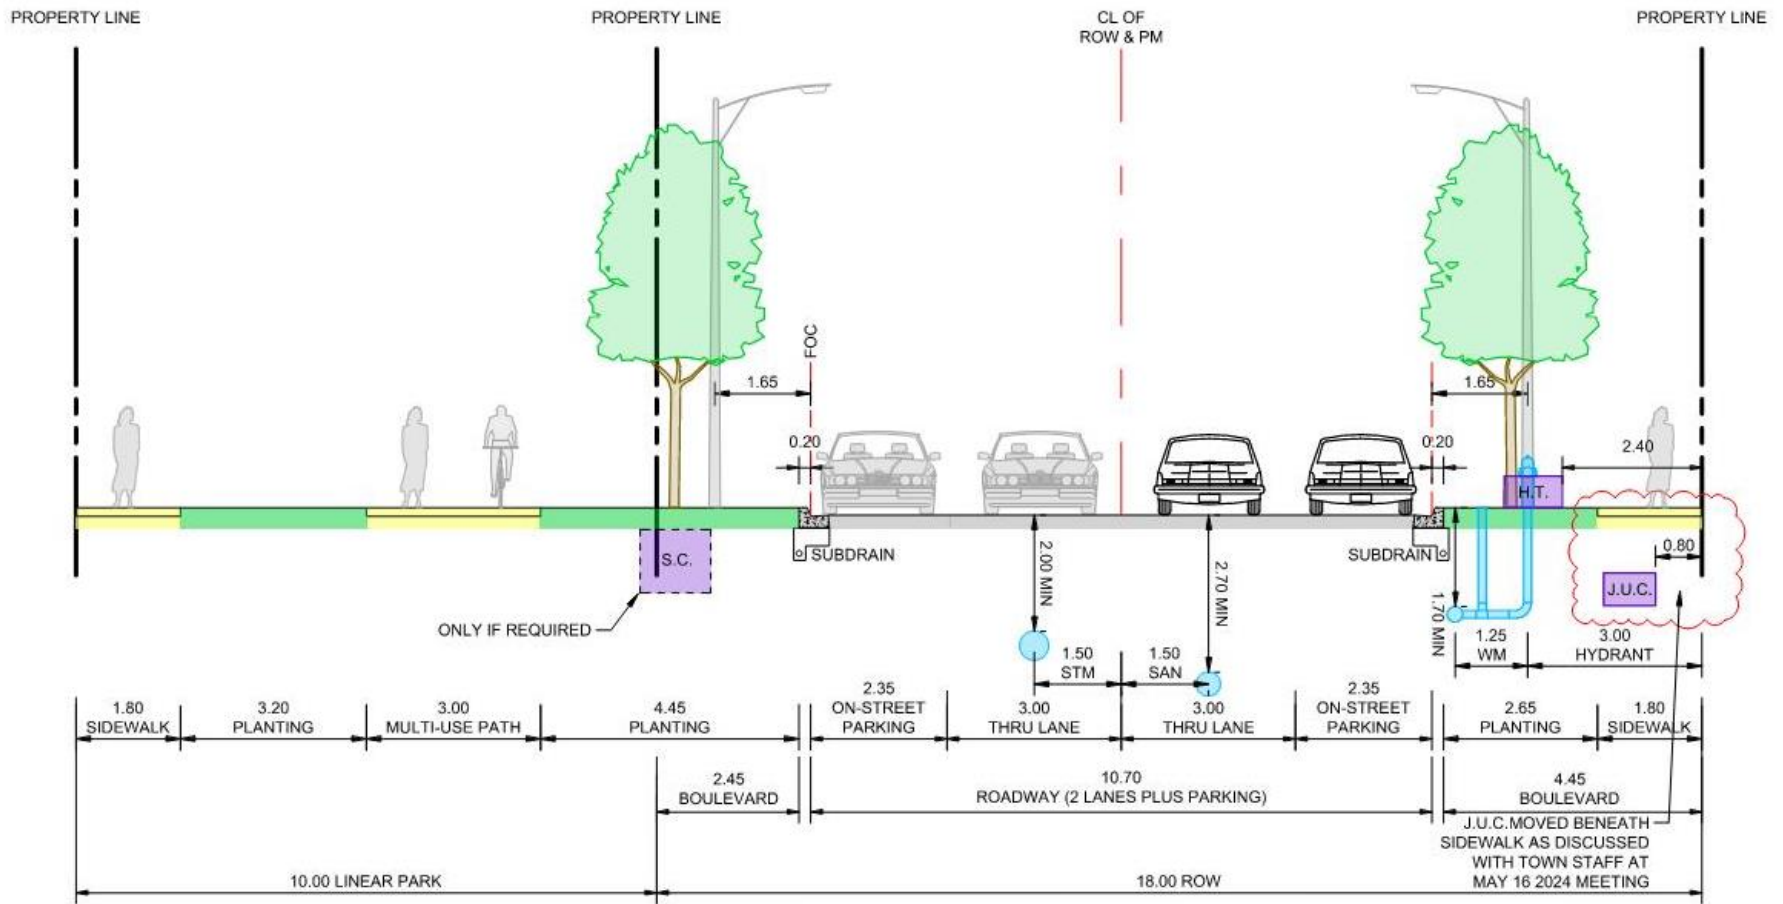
18 METRE CROSS-SECTION: ADJACENT TO LINEAR PARK
